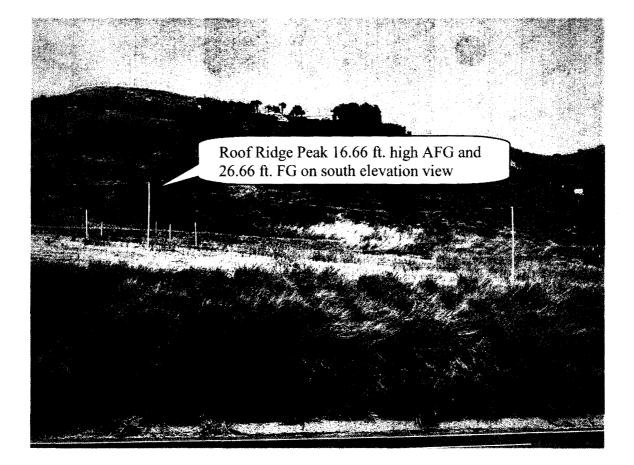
Application No. 4-01-117 Knapp Short Range View from Pacific Coast Highway on highway shoulder, east portion of building site
